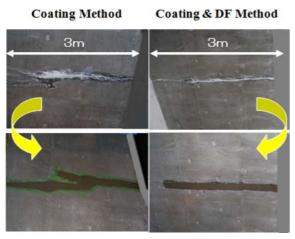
Water-leakage cracks of actual concrete slab and application of new repair methods.
